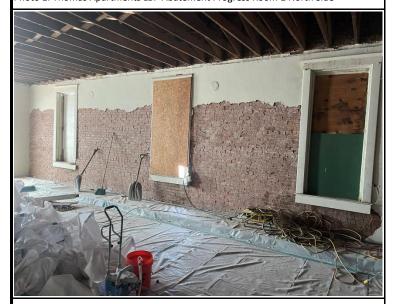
Thomas Apartments LBP Abatement Progress Room 1 West Wall
